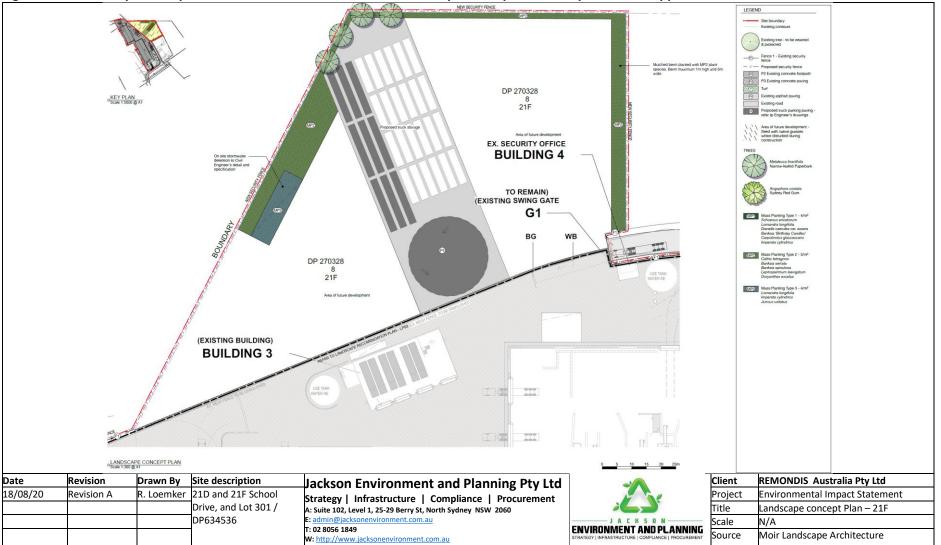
Landscape concept Plan – 21F School Drive. Detailed Landscape Concept Plans are provided in Appendix R.
